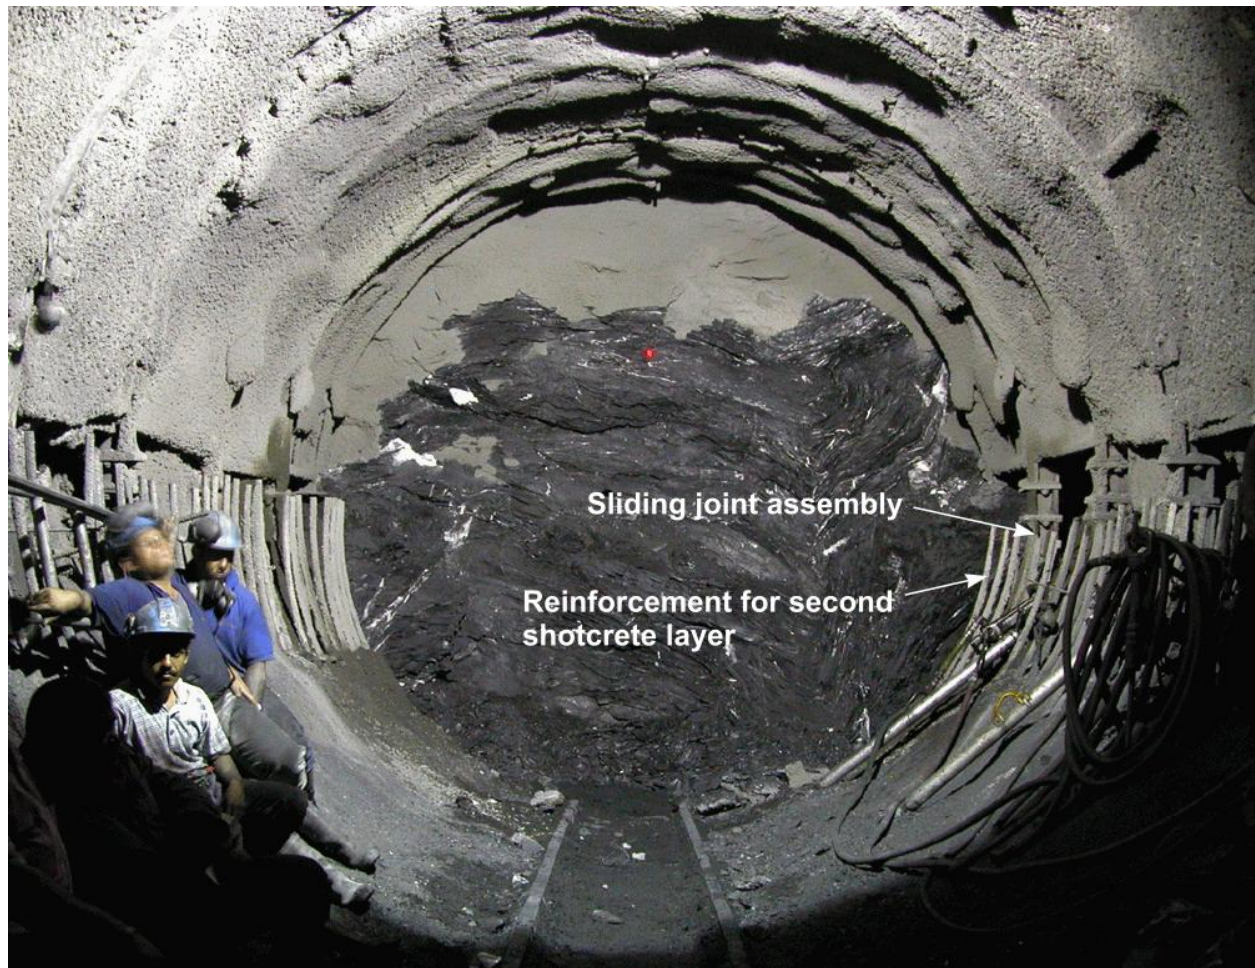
Installation of a circular lining, such as that illustrated in Figure 23, in heavily stressed rock. The sliding joint assembly and the shotcrete window over this gap are shown. Reinforcement for the second layer of shotcrete is visible in this shotcrete gap.
